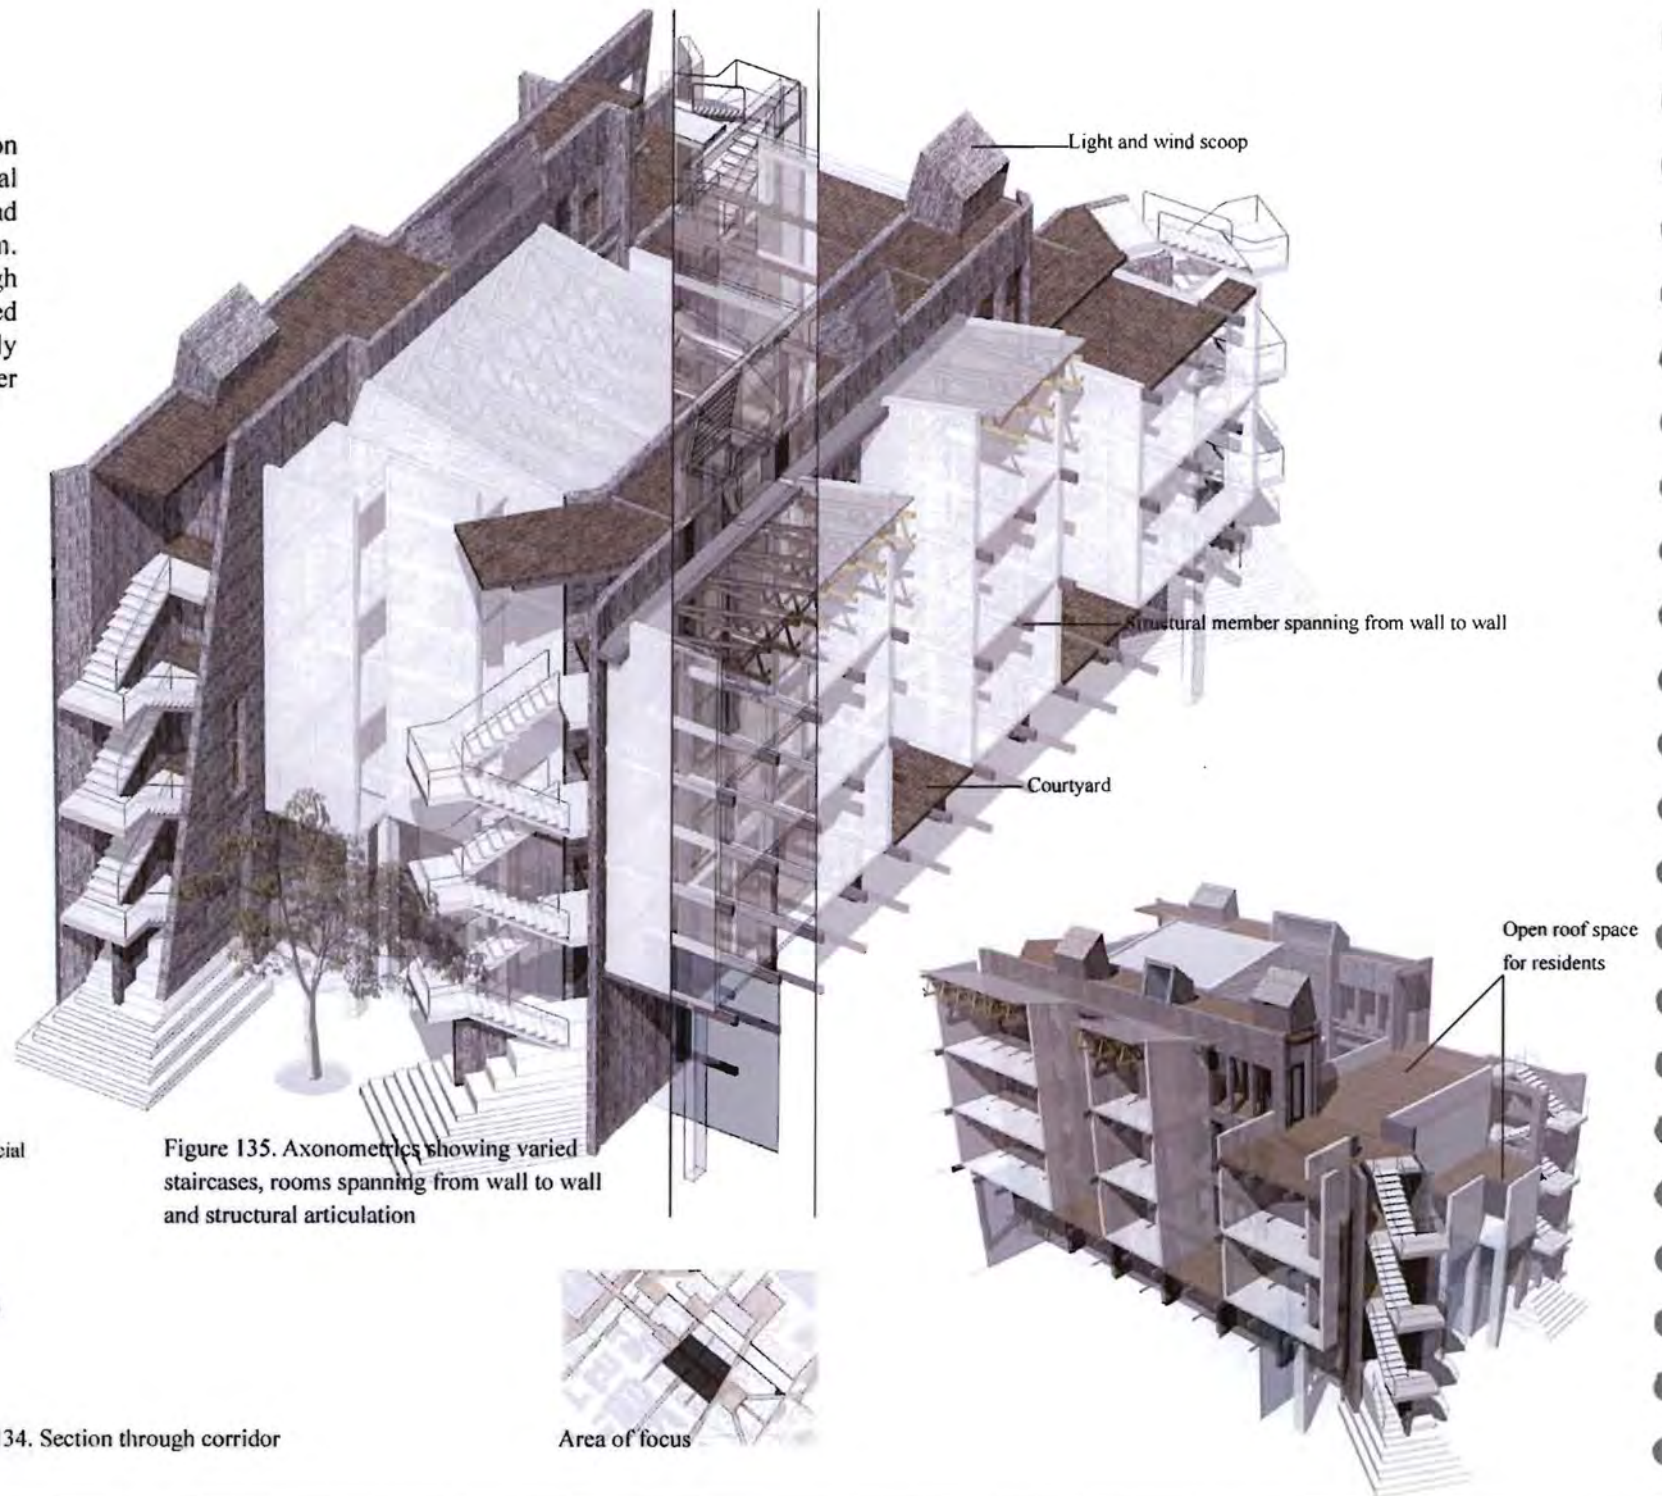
Axonometrics showing varied staircases, rooms spanning from wall to wall and structural articulation
